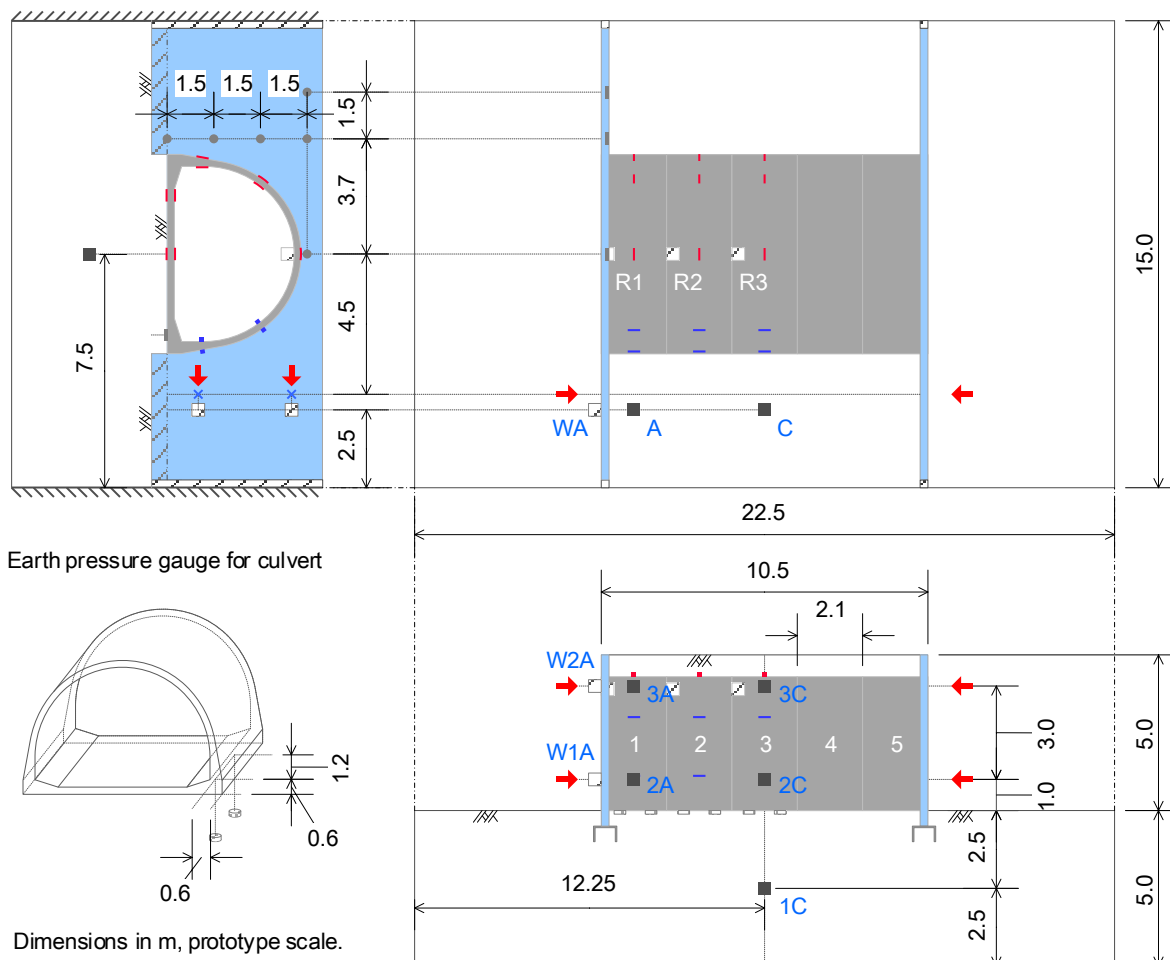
Test instrumentation for Case-1 and Case-2. In Case-0, the test instrumentation is the same as that used for Case-1 and Case-2, except for the sections with connected or separated culverts, as there are no culverts in Case-0.
